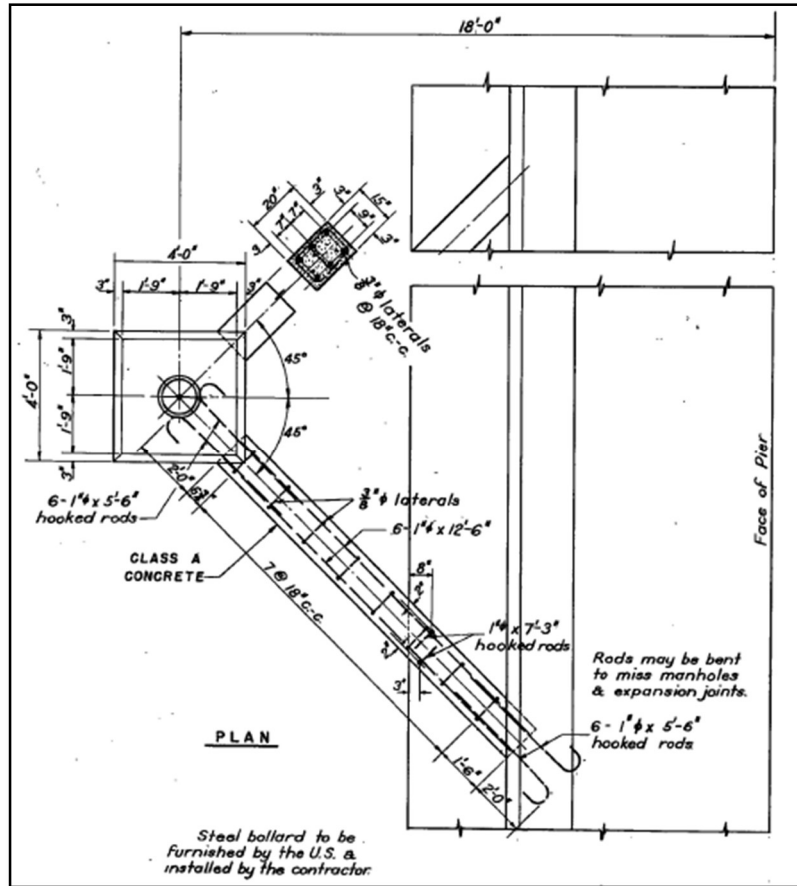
Assumed dimensions of bollard struts (from SW Pier drawing DC-30-29 dated 1944)
